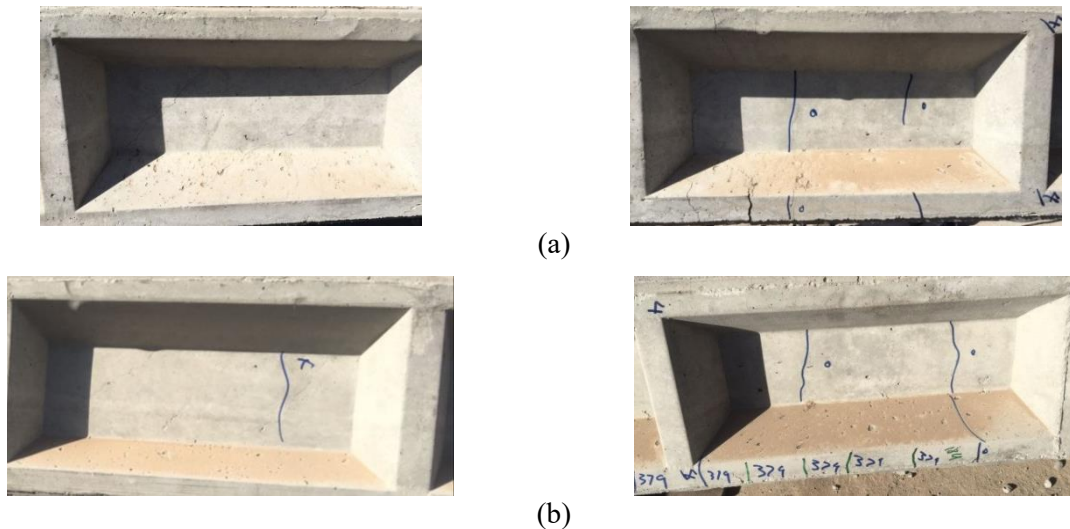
Cracking patterns in: a) 12-400-60-1, and b) 12-400-60-2.
